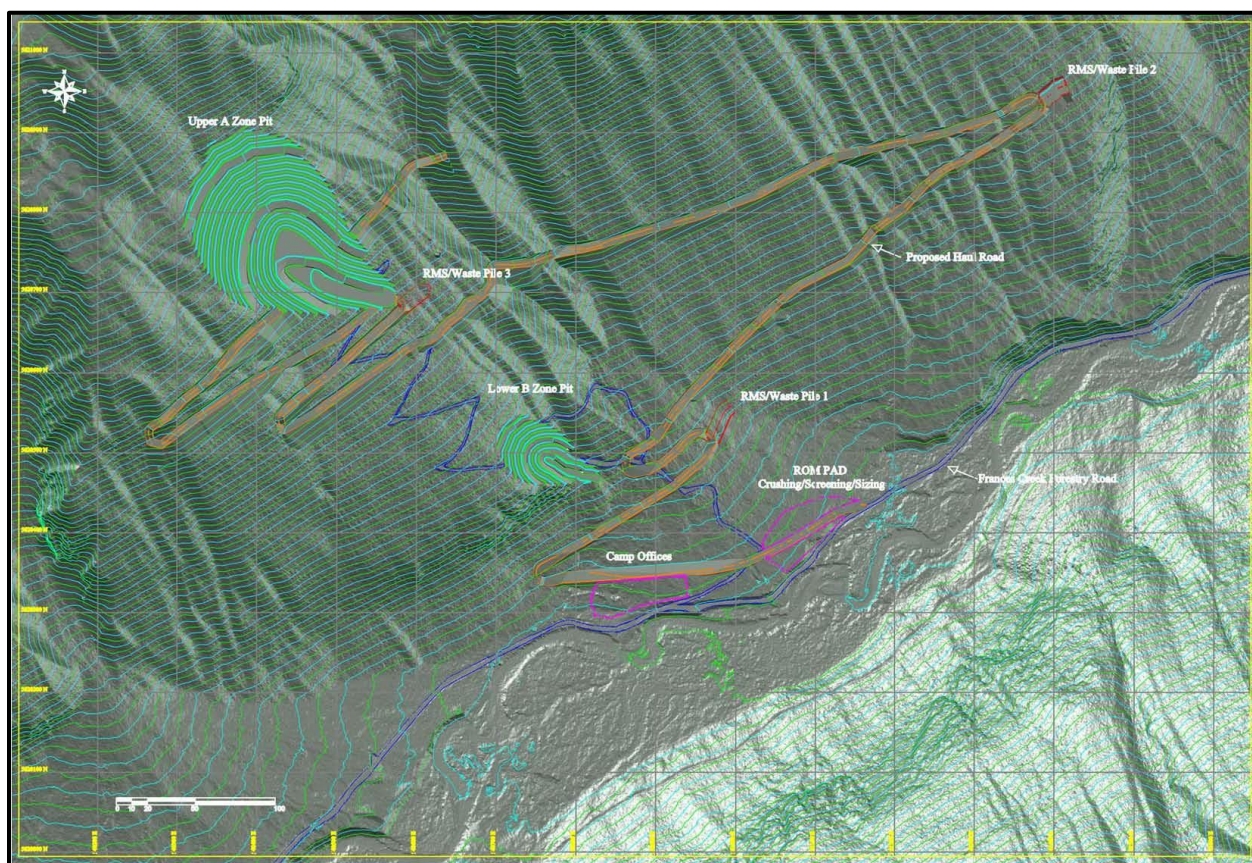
Waste Rock Dump / RMS / ROM Stockpile
